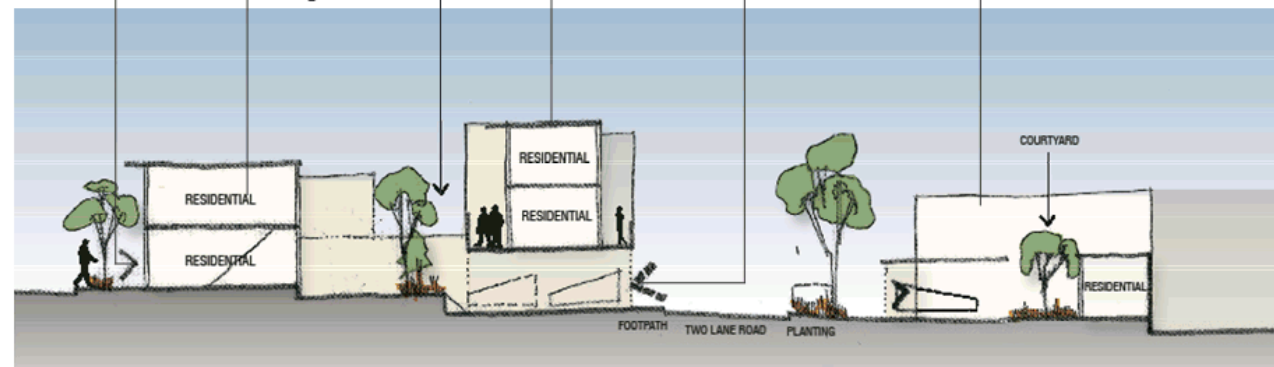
Indicative Townhouse Section (Source: HASSELL, 2008)
